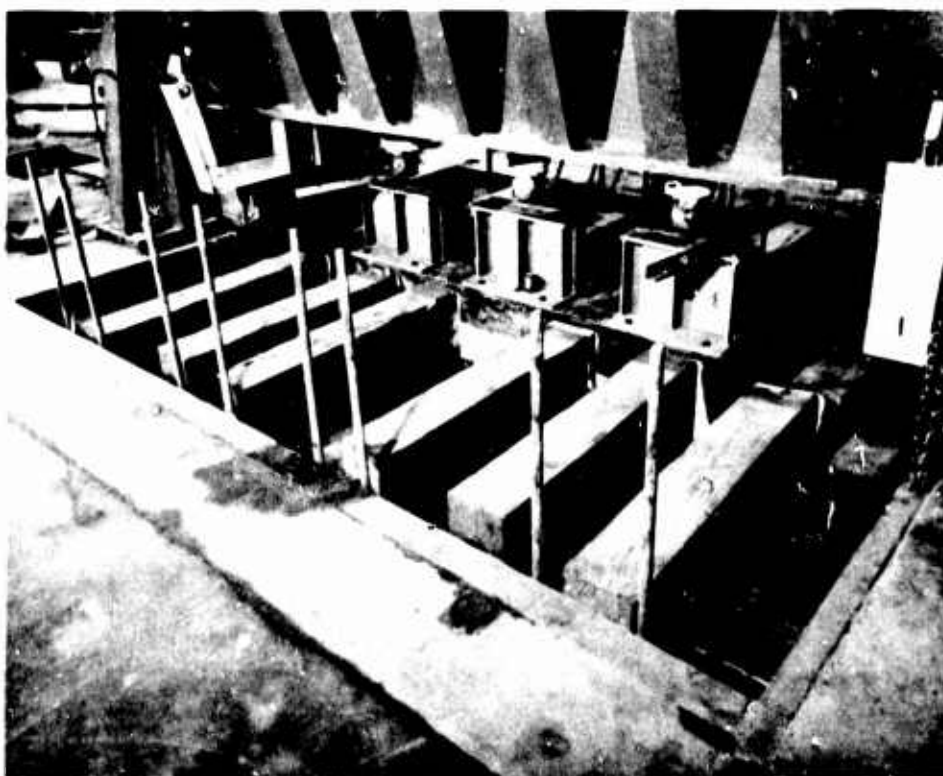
Footing antirotation beams in place and load spreaders mounted on footing.
